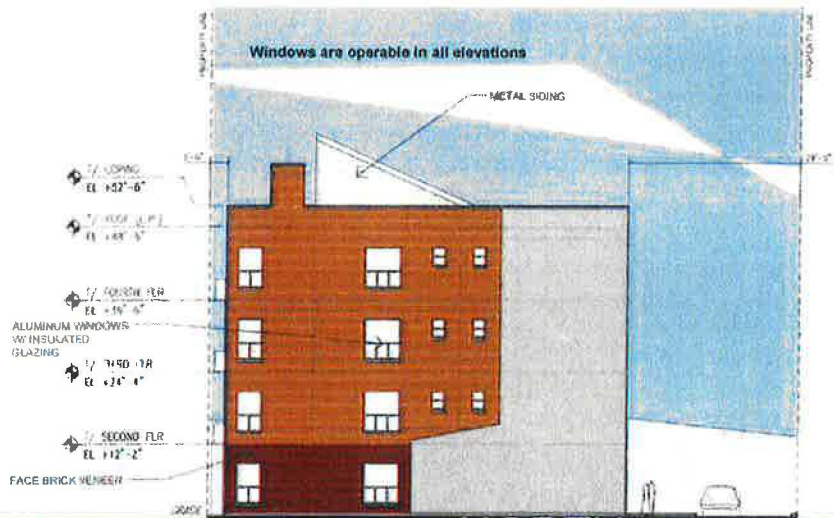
BUILDING ELEVATION - NORTH (LIGHT WELL)
